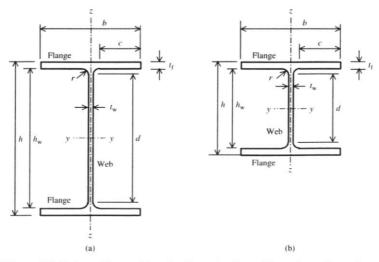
Universal beam (a) and universal column (b) sections: dimensions
